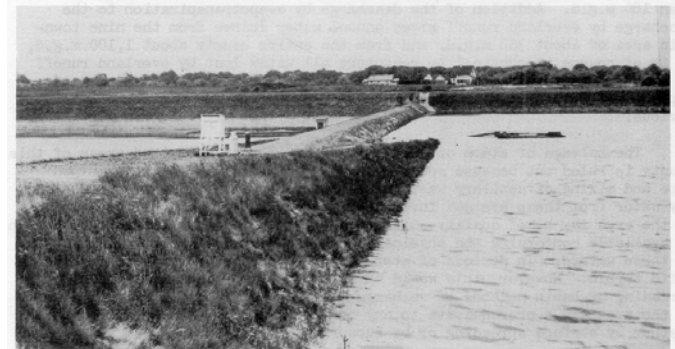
Photographs showing the overflow spillway and the embankment between the north and south units, Rockaway Road recharge basin, Garden City, New York. (Courtesy of Department of Public Works, Nassau County, New York.)
